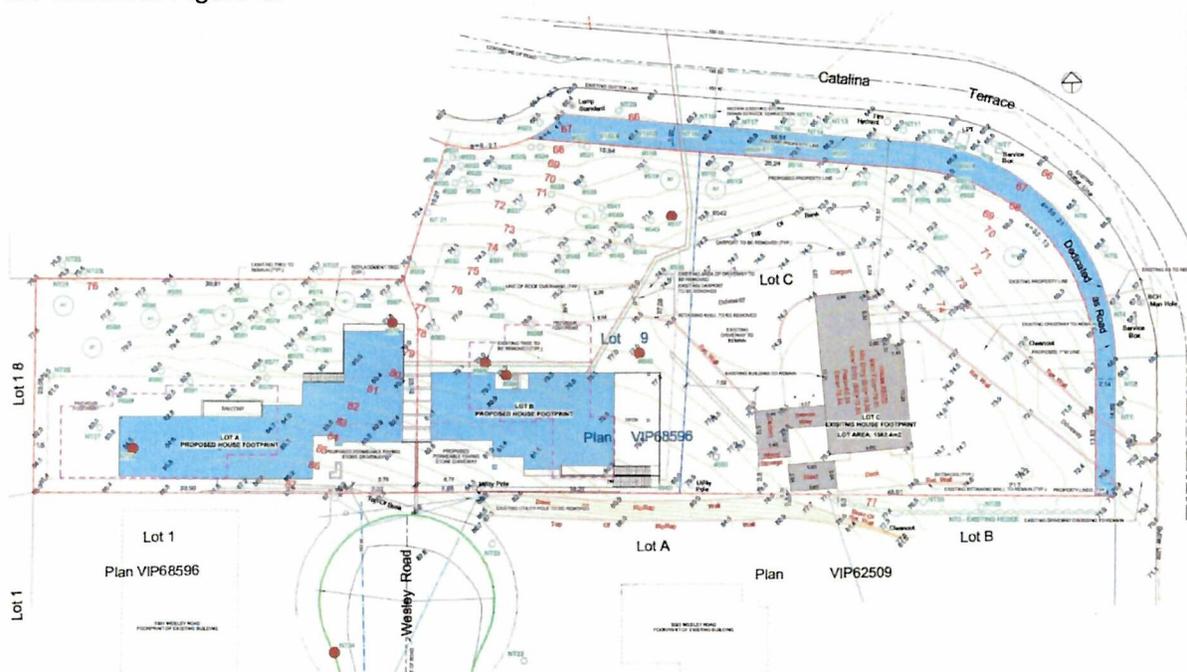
Proposed Site Plan (by Ryan Hoyt Designs Inc.)
